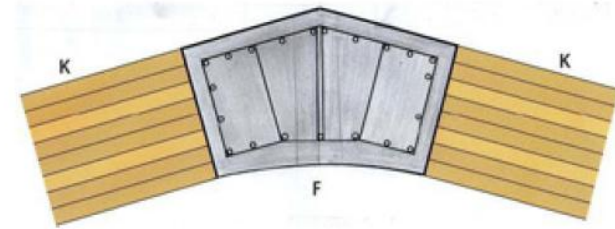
Plan of reinforced concrete shear key (section A-A of Figure 3).
